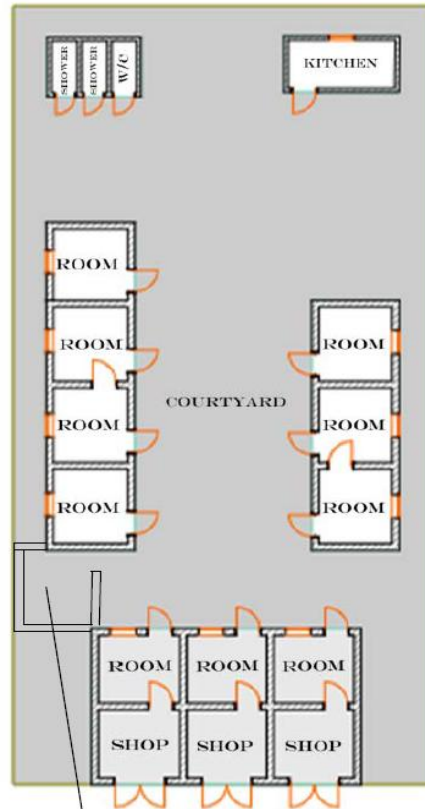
Conceptual layout plan of a typical compound in Sabon Gari
